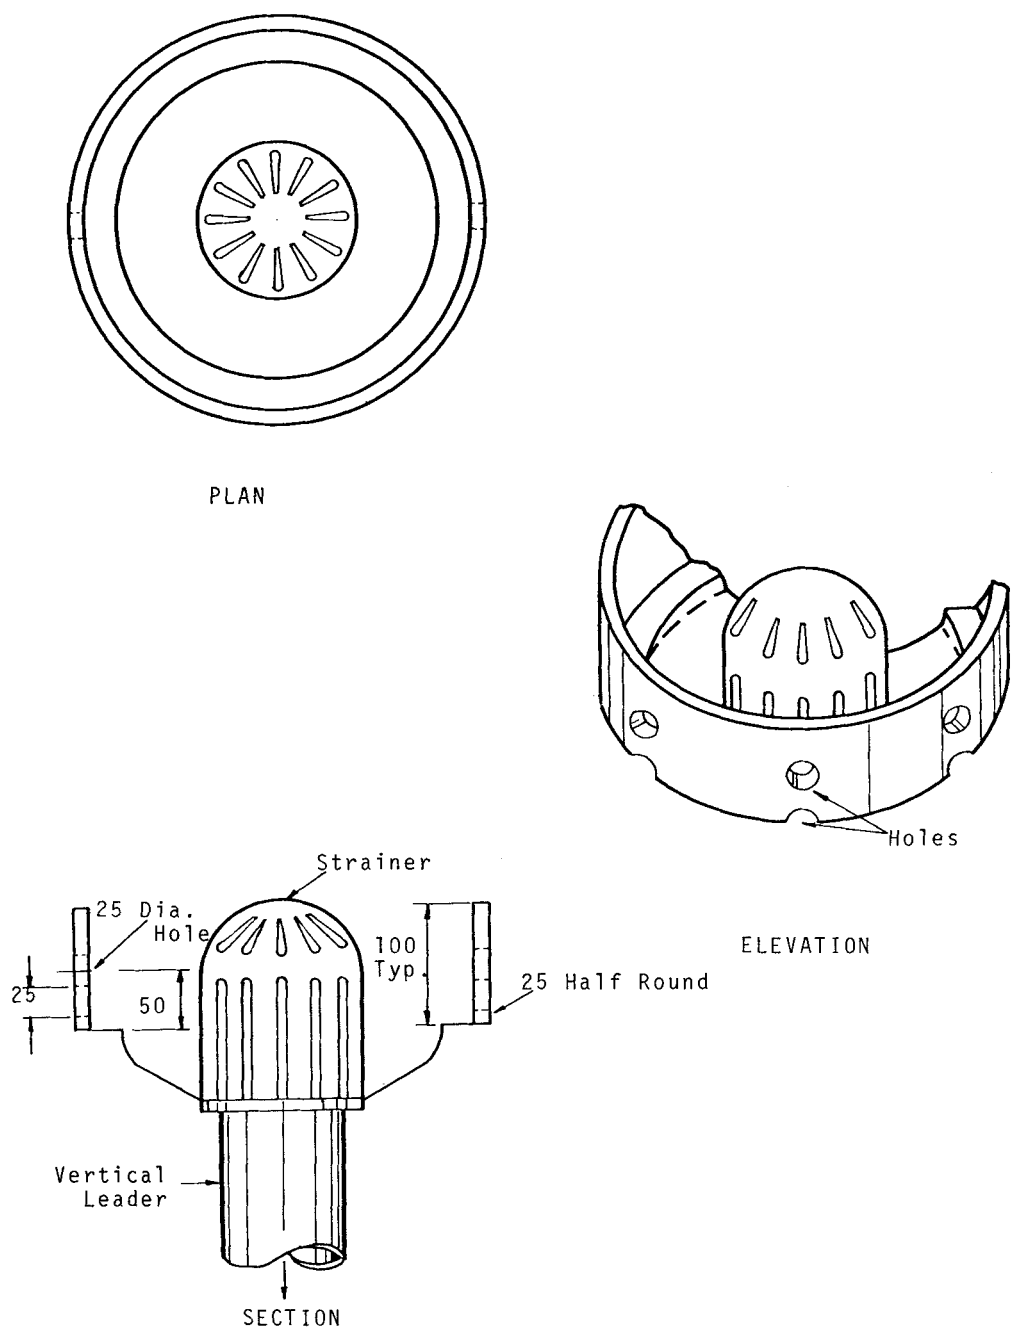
Rainfall Detention Ponding Ring for Flat Roofs
